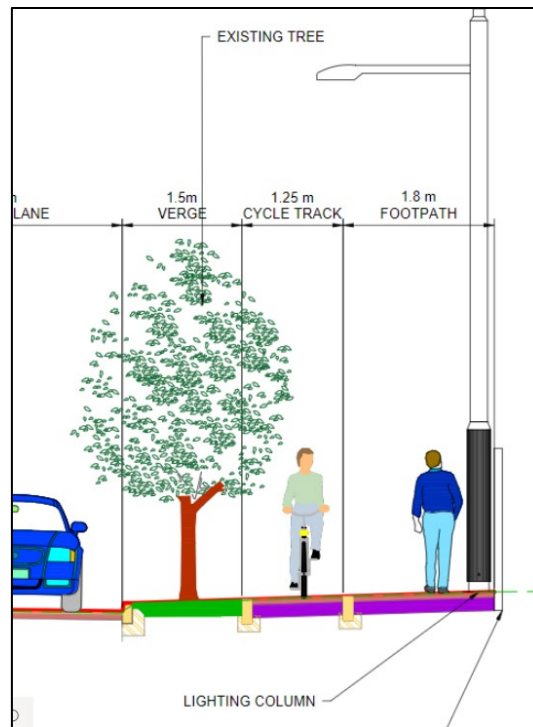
Extract from Typical Sections Drawing – St. Mobhi Road
